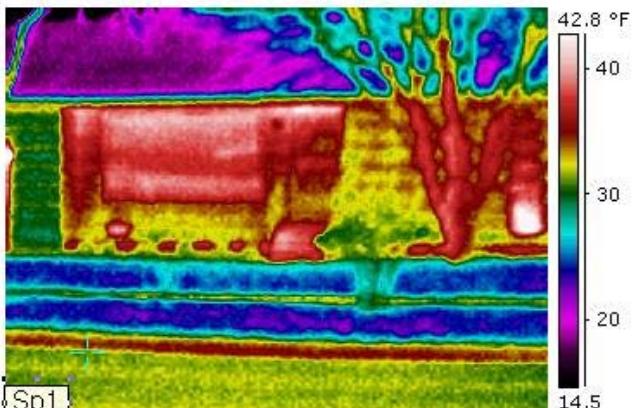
Test House, Day 1 at  $T_6$  - Notice the wall-heating unit on the right.
